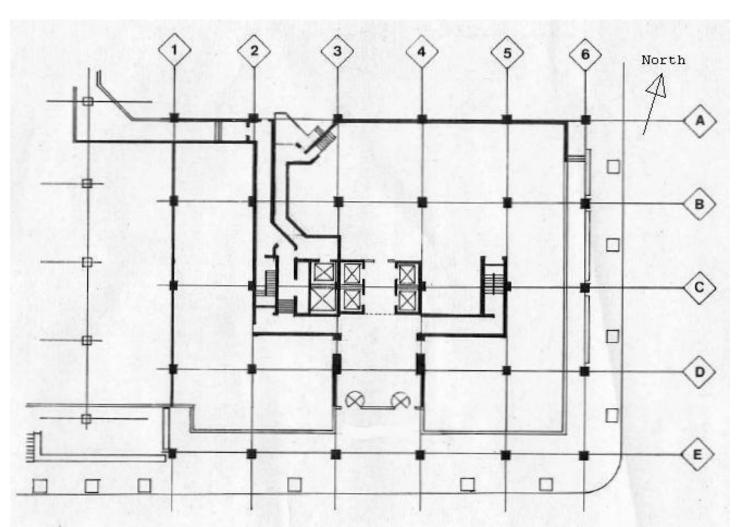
Original plan layout of the first-floor plan of Two (courtesy of Transwestern annotated with arrow)
